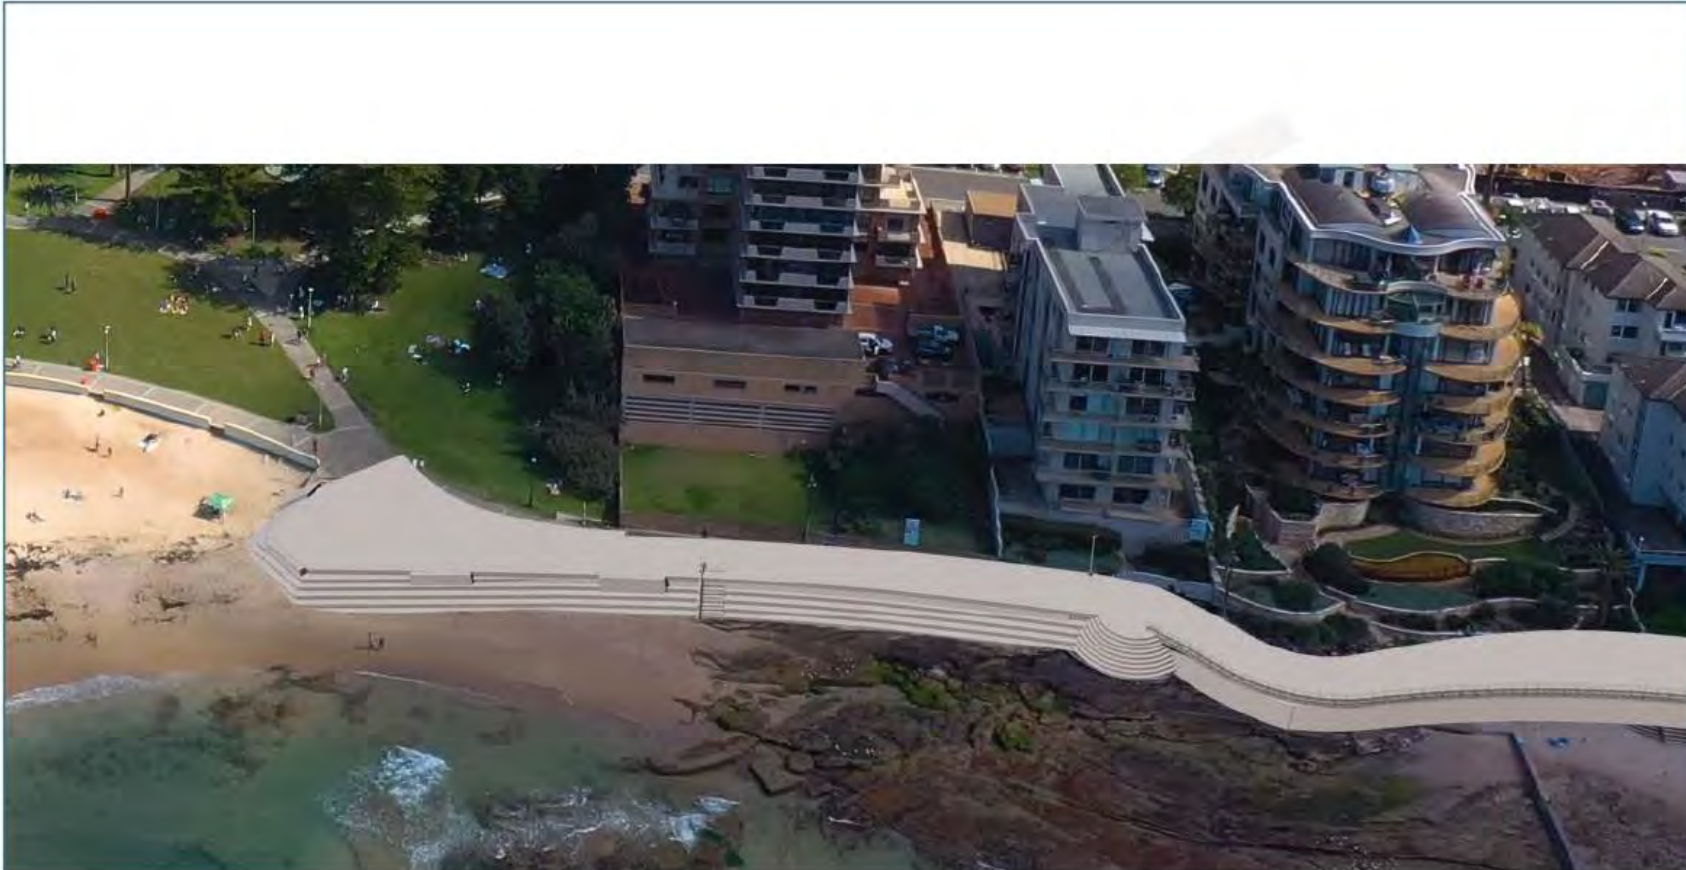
Option 3 - Widen Path with Bleachers, Access Ramps & Maintain Walkway Alignment – South
